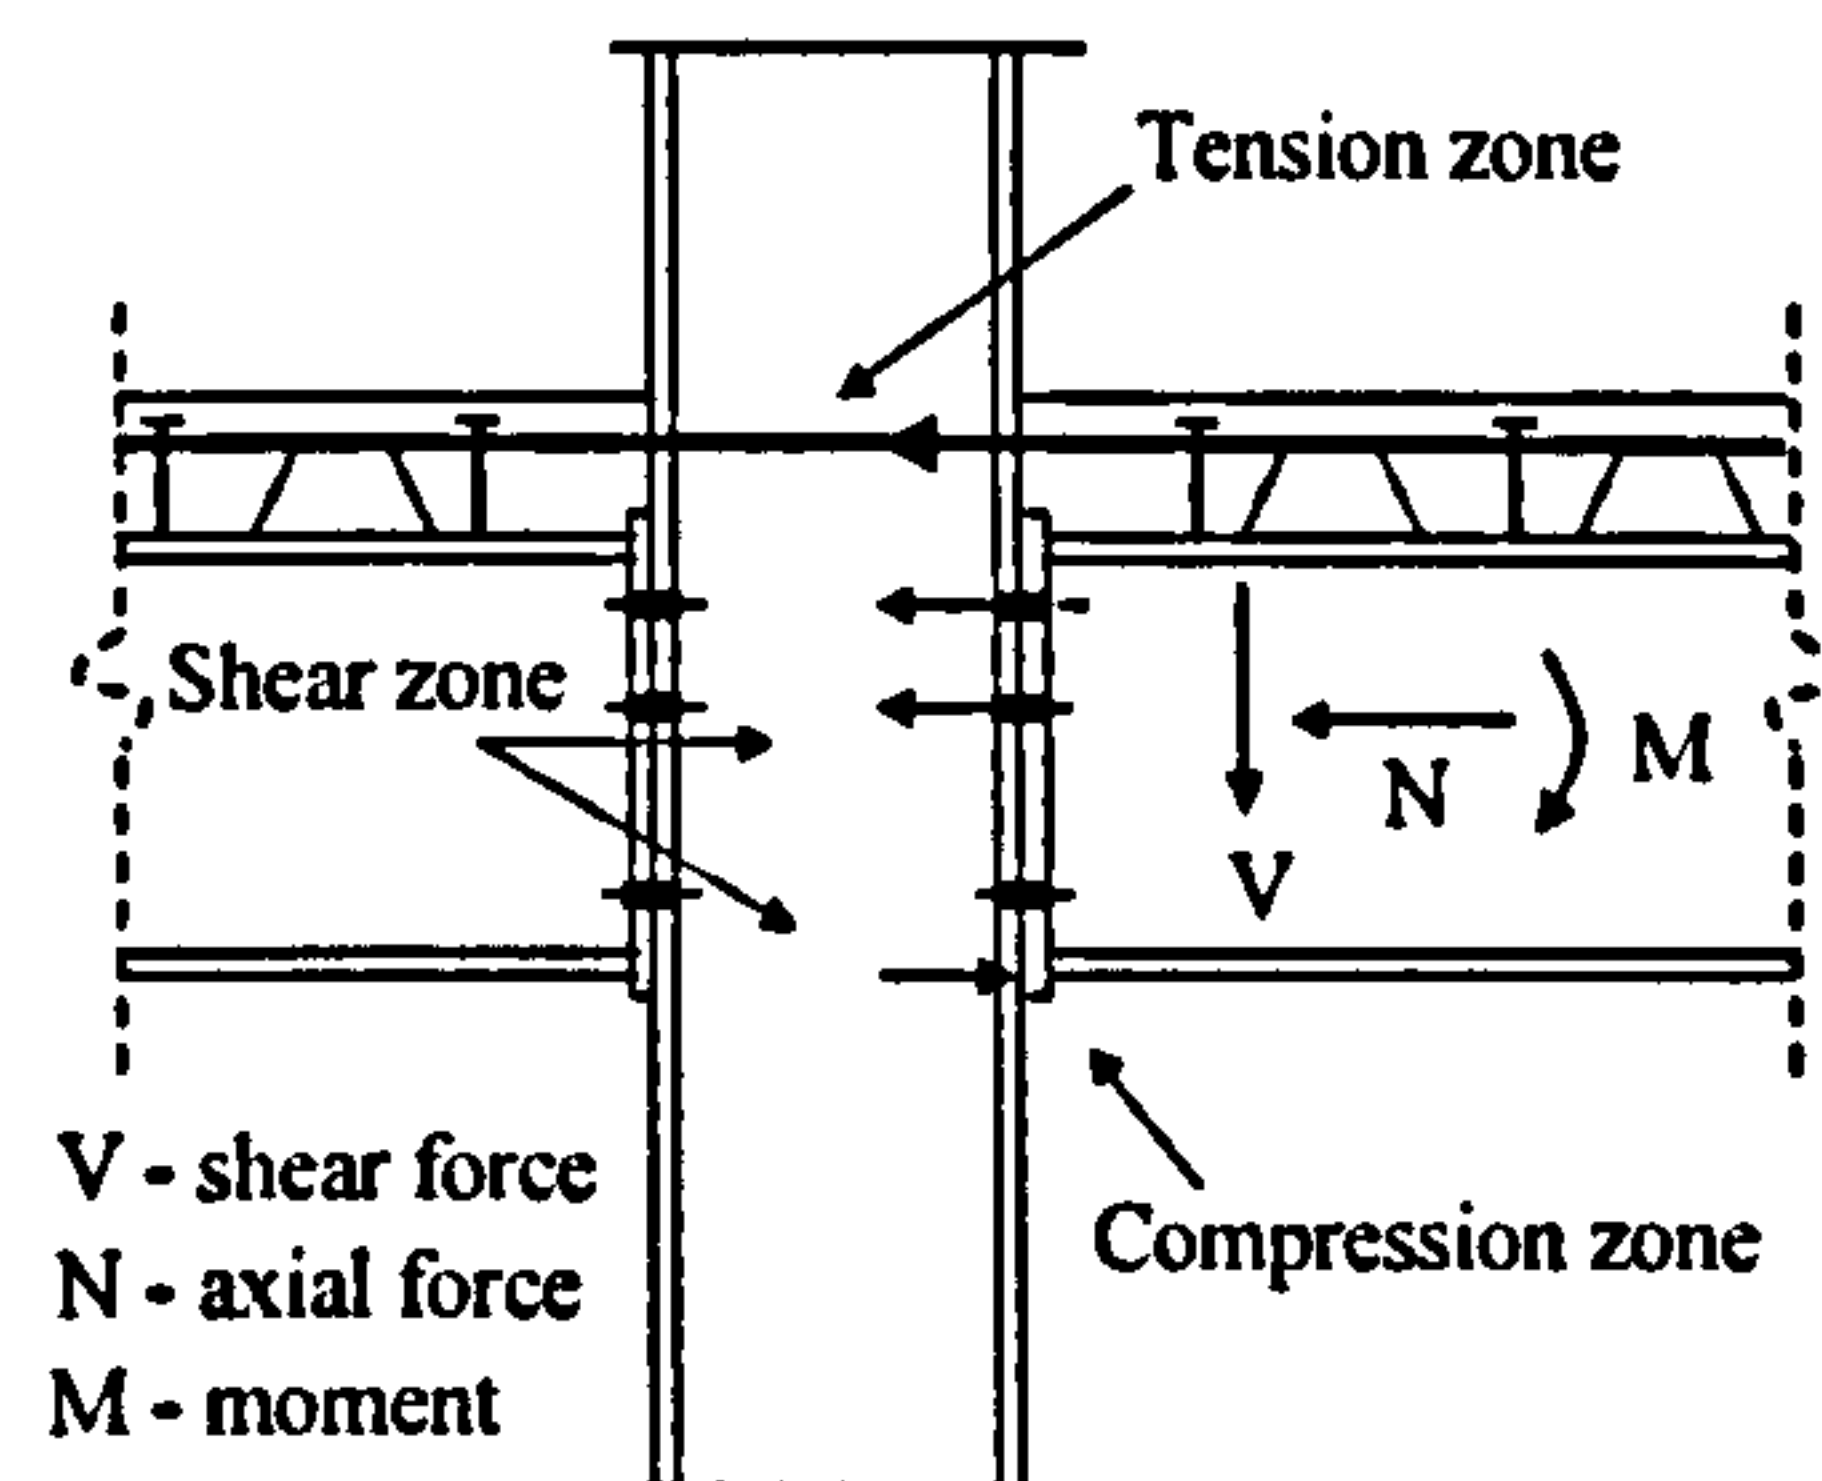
Composite endplate beam to column connection, SCI 1998
